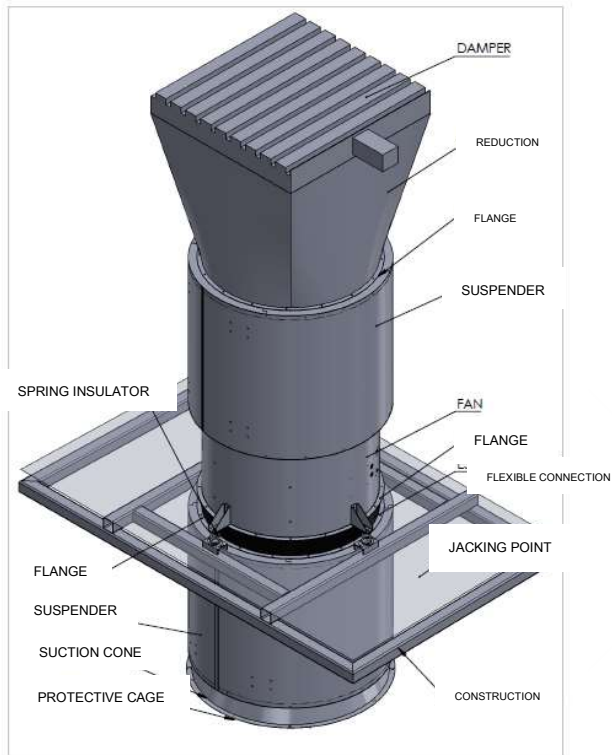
Vertical Mounting Detail of Axial Fan and Accessories in Shaft - 1
